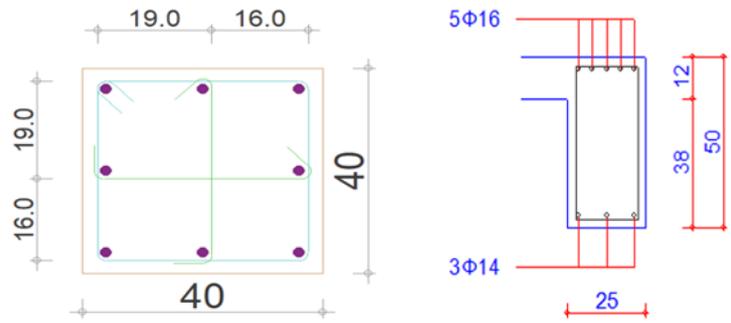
Sample Section Detail of Columns (left) and Beams (right)
